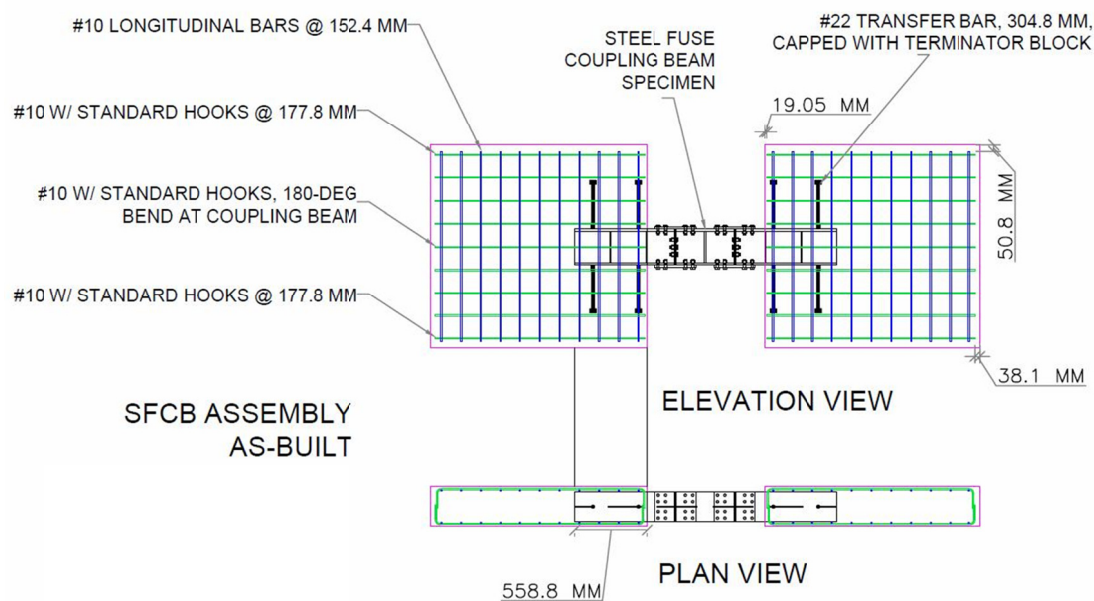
Specimen sub-assembly as-built of SFCB and reinforced concrete walls
